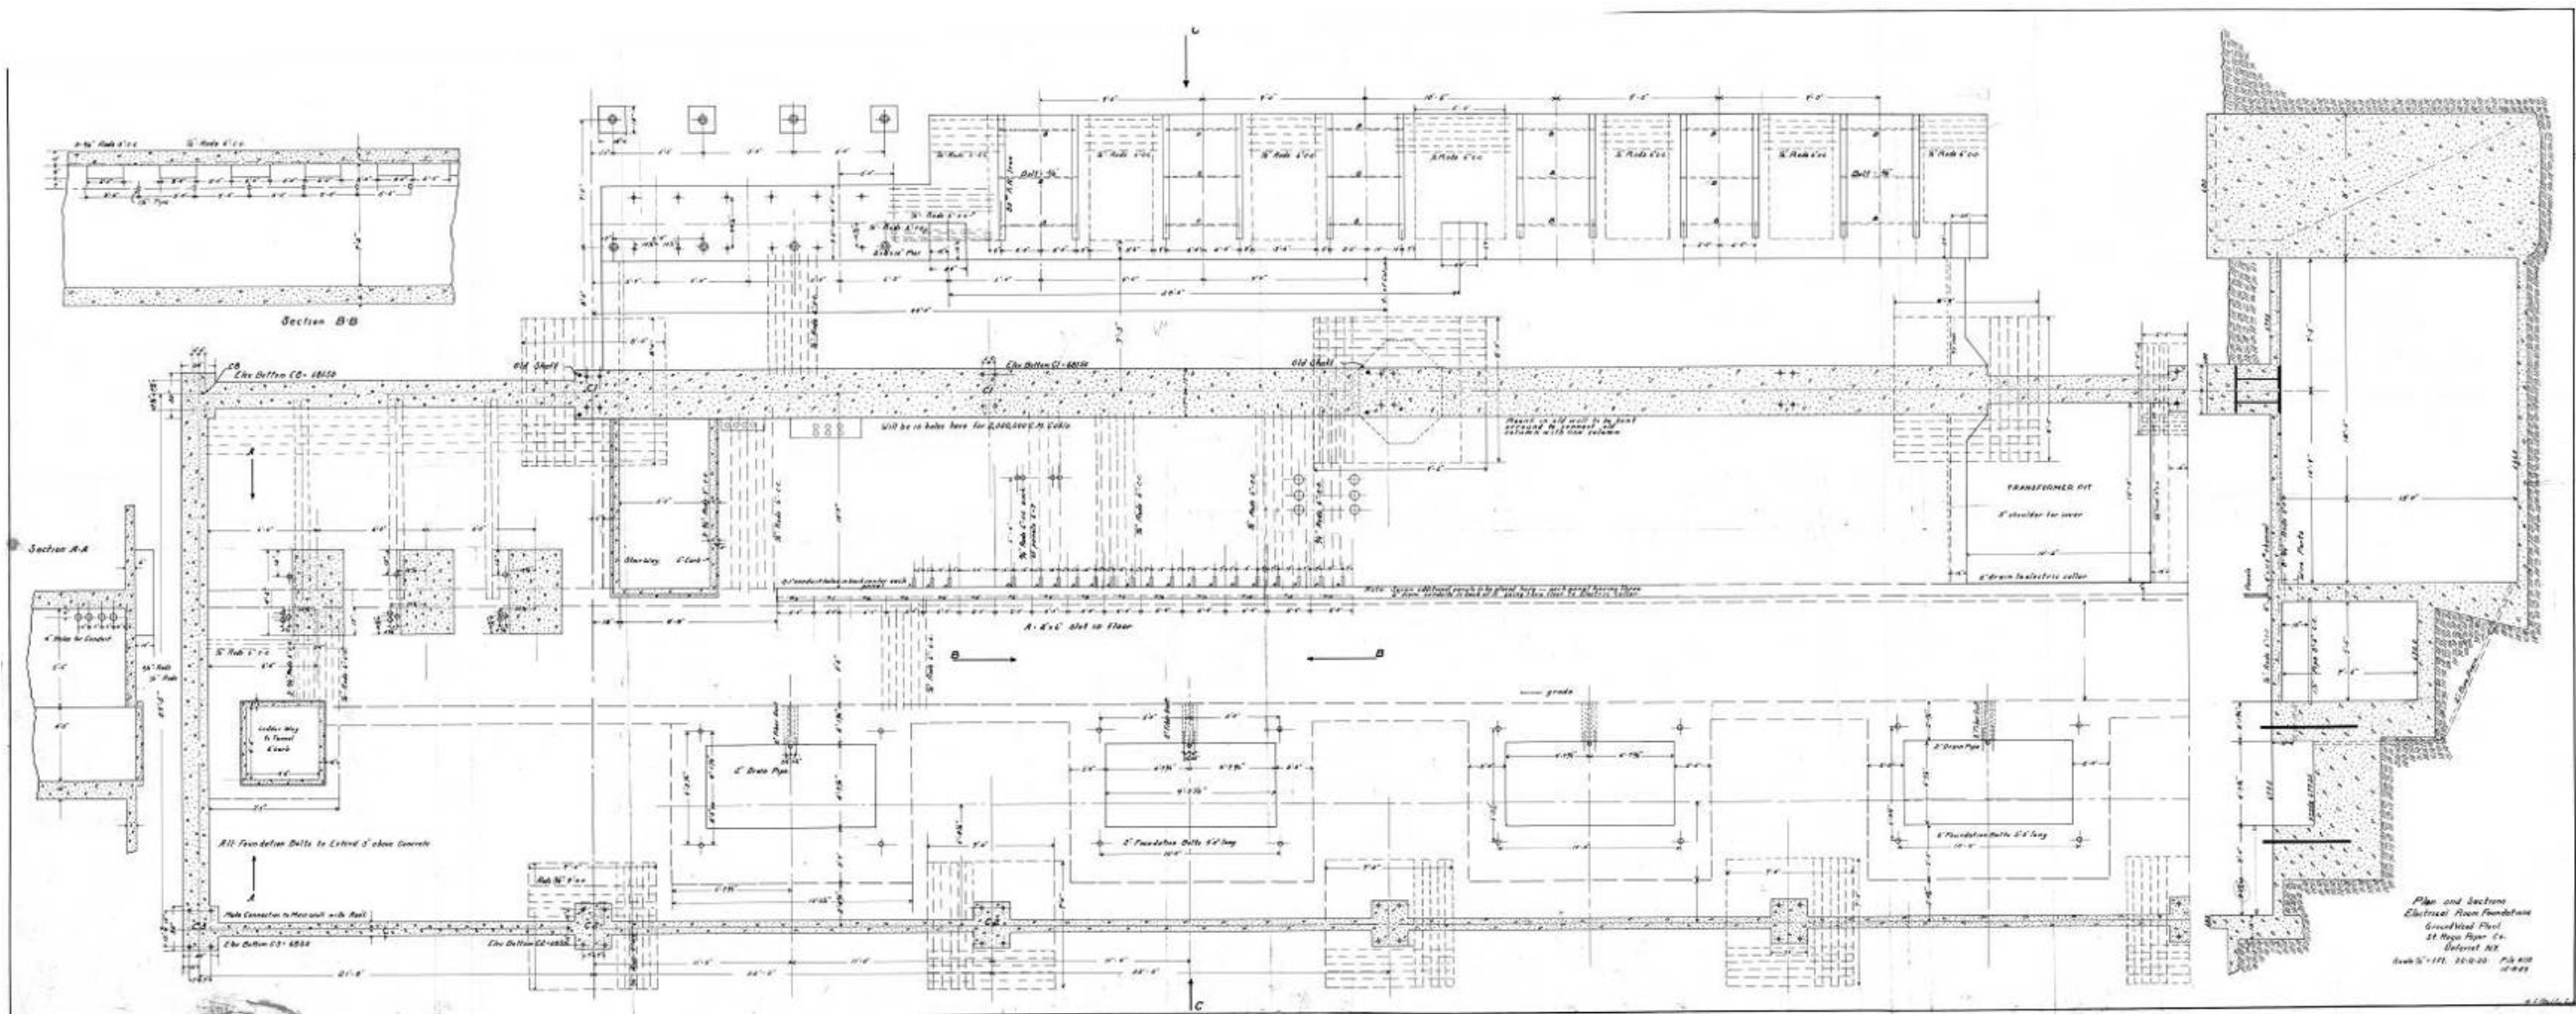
Section through the electrical room at the Greenwood mill (undated).
